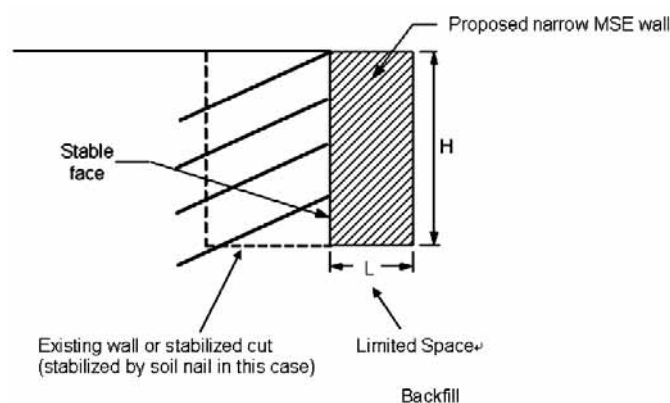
Illustration of proposed narrow MSE wall in front of a stable face
